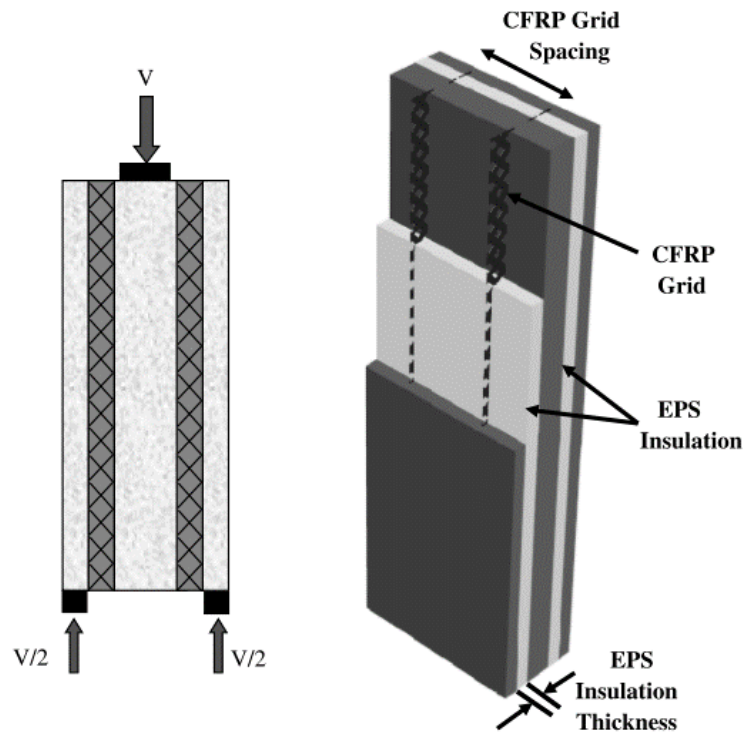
Typical shear test setup for connectors in insulated concrete walls (Hodicky et al. 2014)
